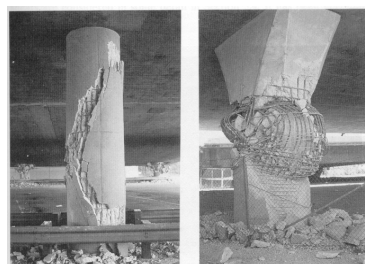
Nortrige, U.S.A., 1994, M=6.7: Pier's Shear Failure
